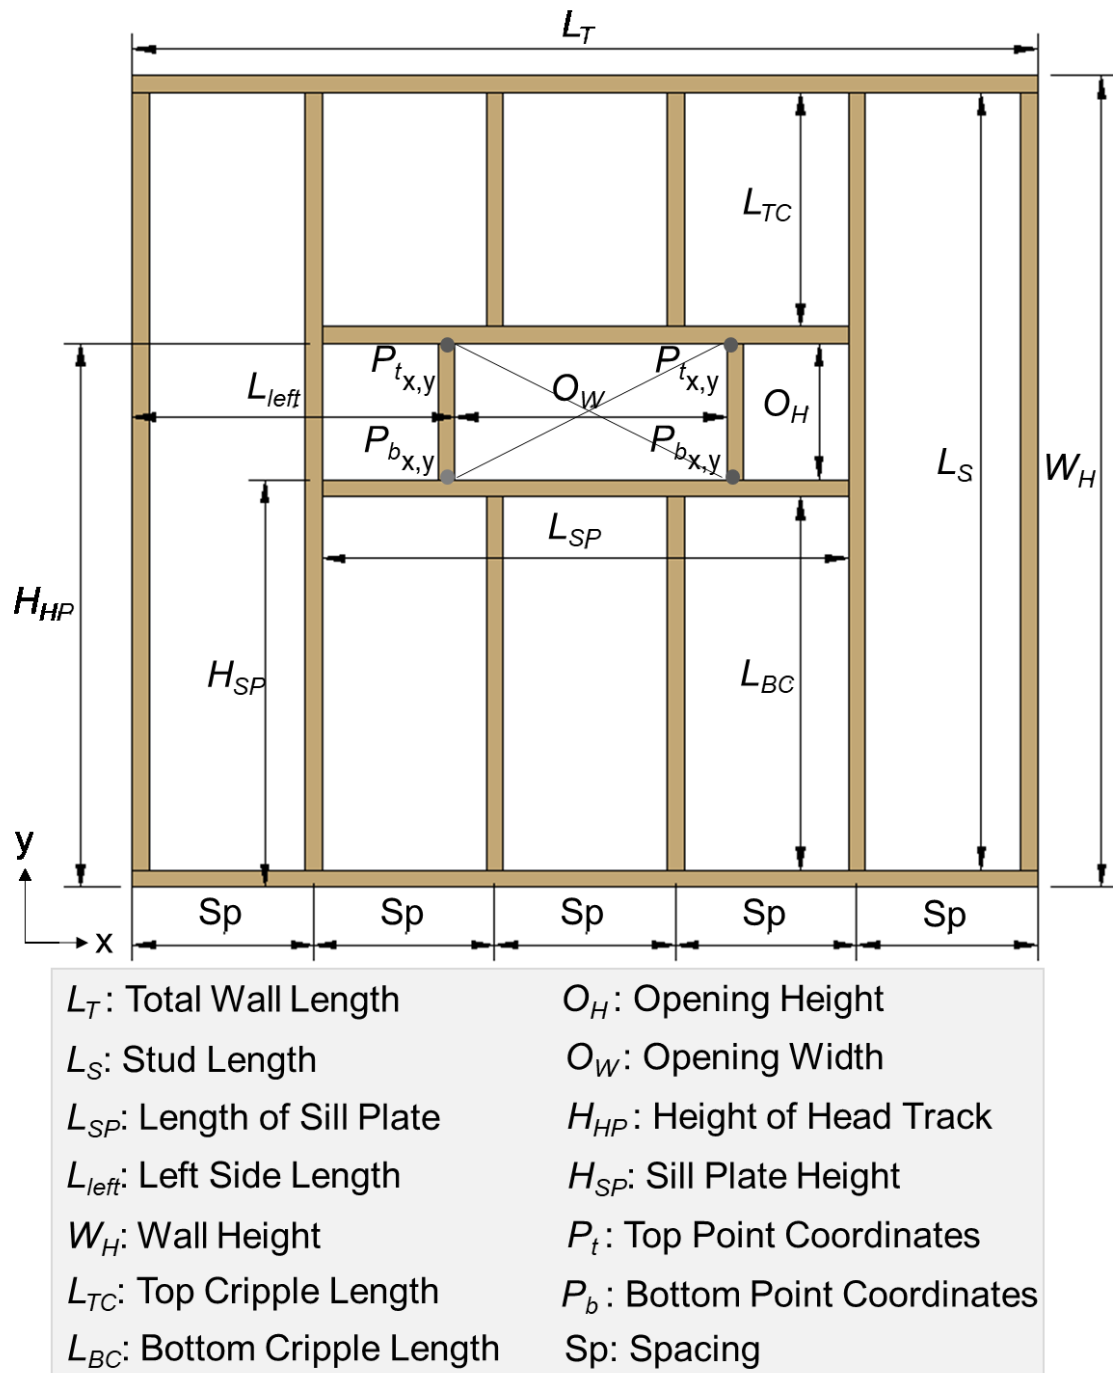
Defined variables in the case of wall framing around mechanical opening
